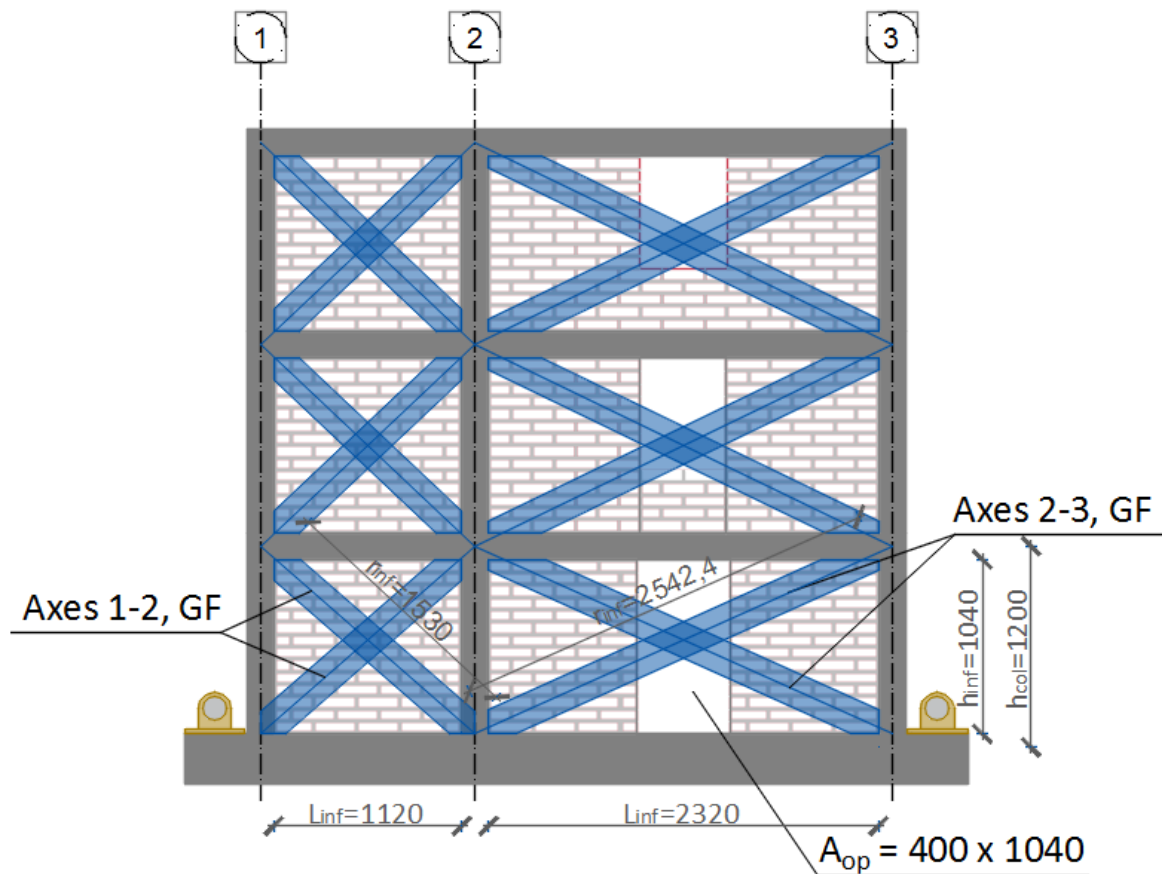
Diagonal strut properties for Ground floor of Frame 1 and 2
